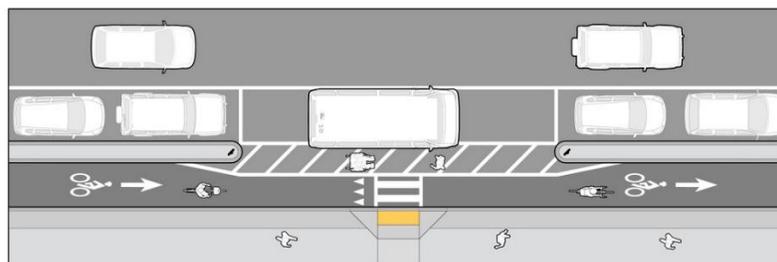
Proposed cross section for median-separated bike lanes with parking cut-outs from Farnsleigh Road to Parkland Drive/Lynnfield Road.
